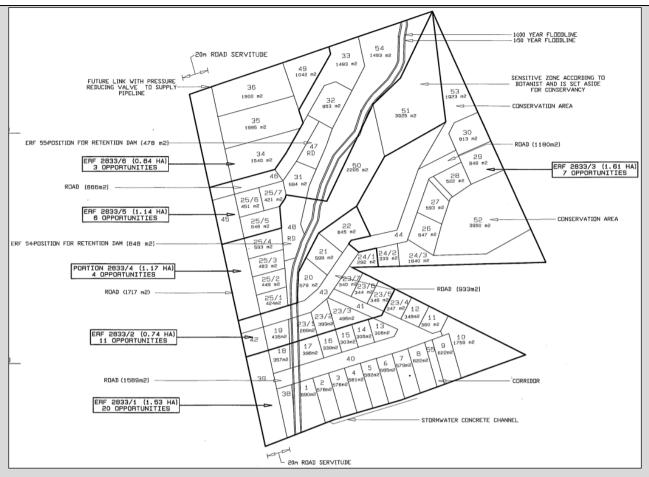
Previously Authorised Layout Plan (source: KCWC Consulting Engineers and Project Managers).
